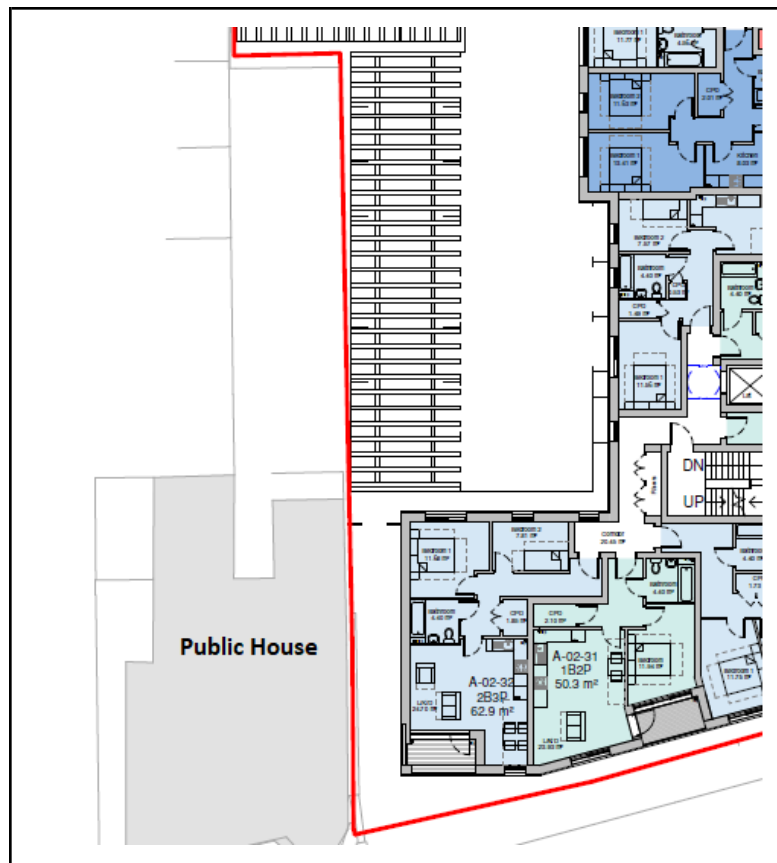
Block A in relation to Public House (2nd floor layout shown)
